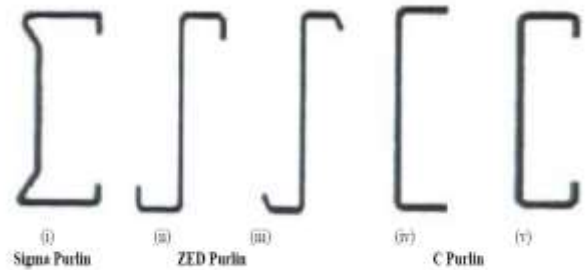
Typical Cold Formed Section Profiles used for purlin
